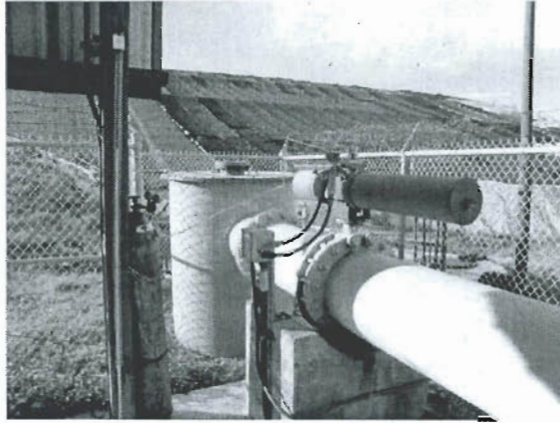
Flare Knock-Out Drum Main Inlet Valve
